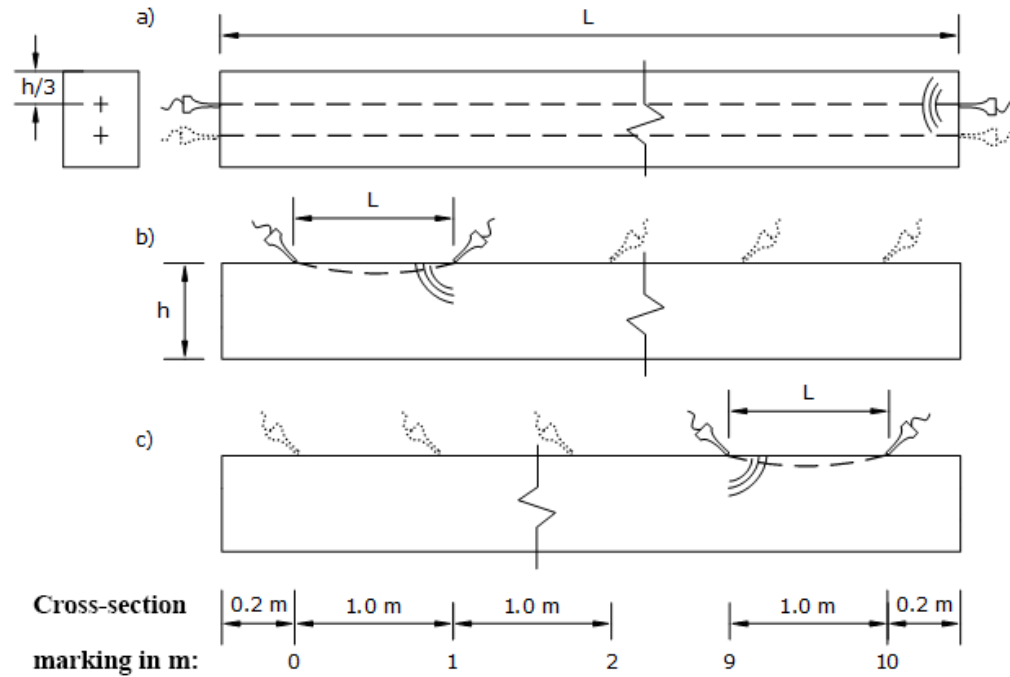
Details of the marking of the pieces, end-to-end (a) and surface (b) measurement.
